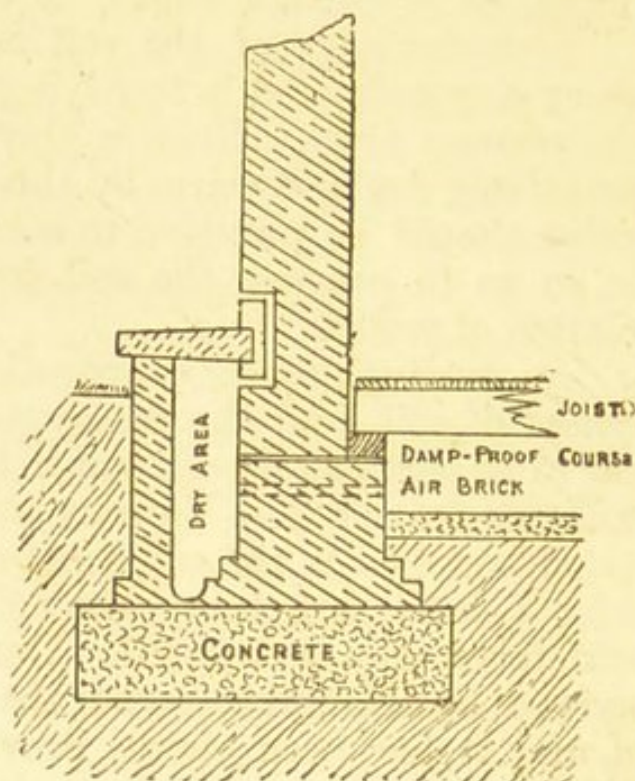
Concrete Foundation, Dry Area, Damp-proof Course, and Ventilation under Floor.
